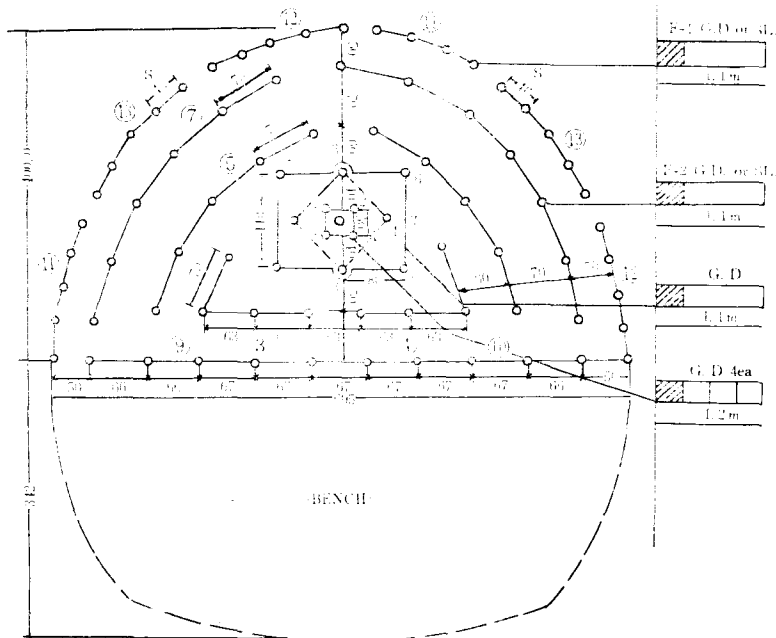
; Drilling & blasting pattern (rock type 1)
